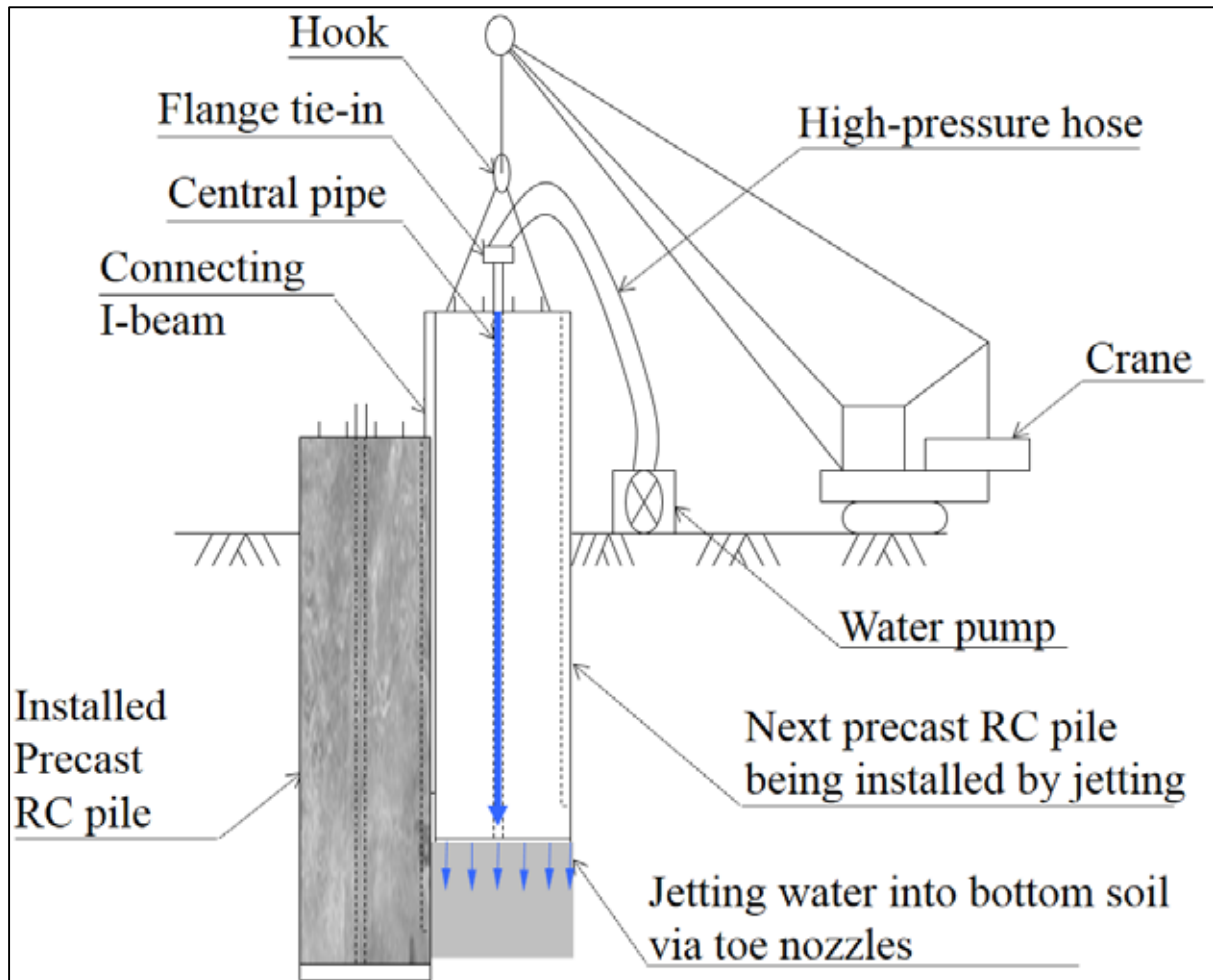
Installation of two connected rectangular precast reinforced concrete piles with jetting of pressurized water from pile head into the toe nozzles via the central pipe
